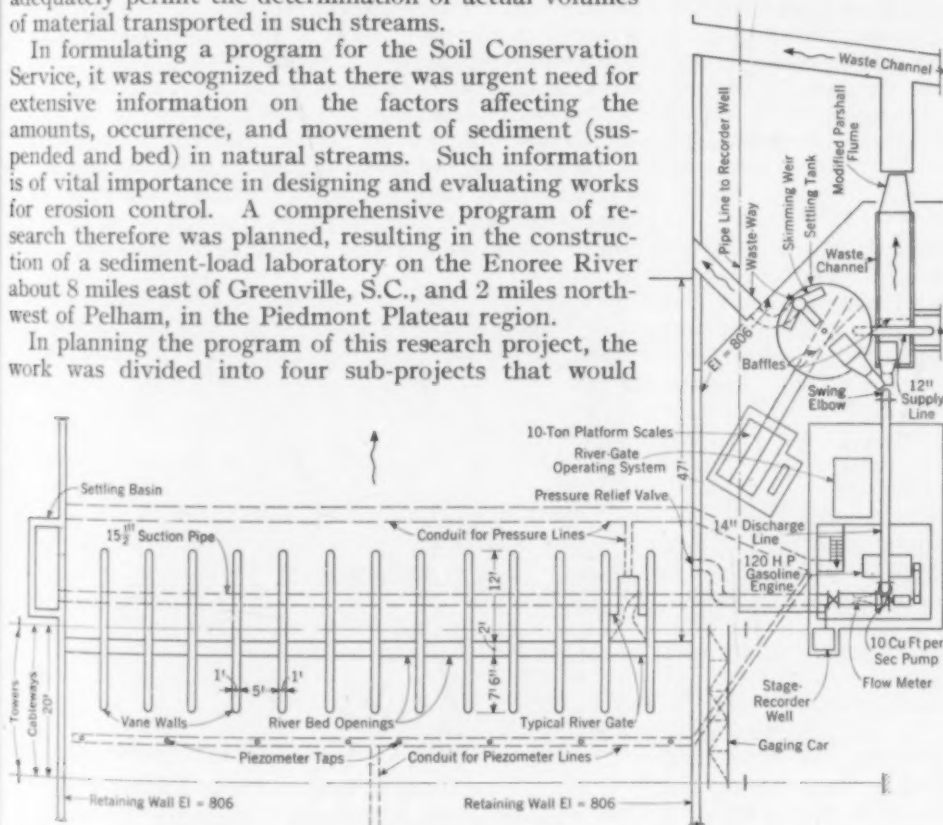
GENERAL PLAN OF ENOREE RIVER SEDIMENT-LOAD LABORATORY
